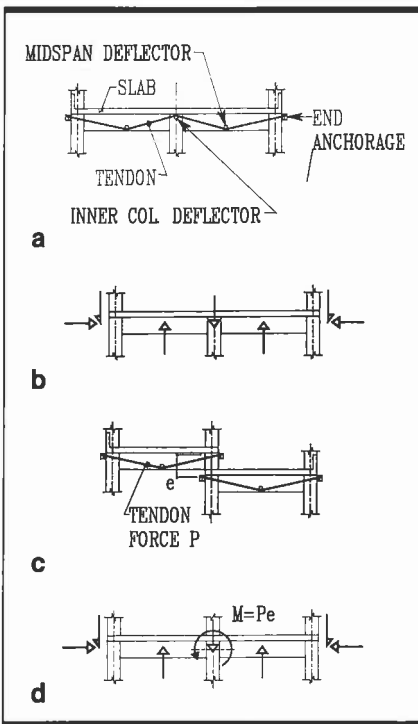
For the analysis of the beam frames, the externally applied post-tensioning was substituted by the forces it exerts on the structure: a) elevation; b) balanced loading; c) elevation at split level; d) modelled balanced loading at split level.
